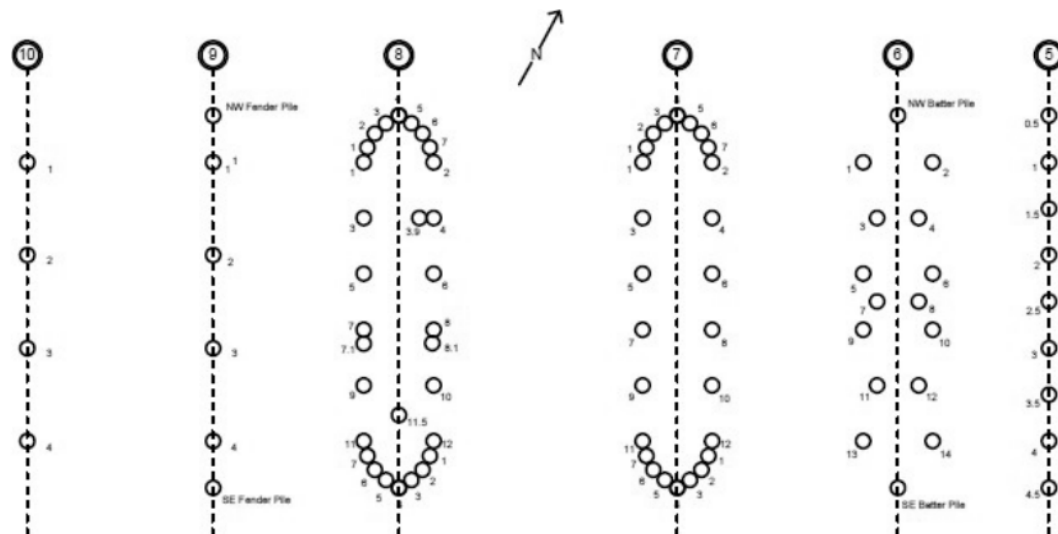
Figure A Pier and Pile Numbering System for the Pender Island Canal Bridge
